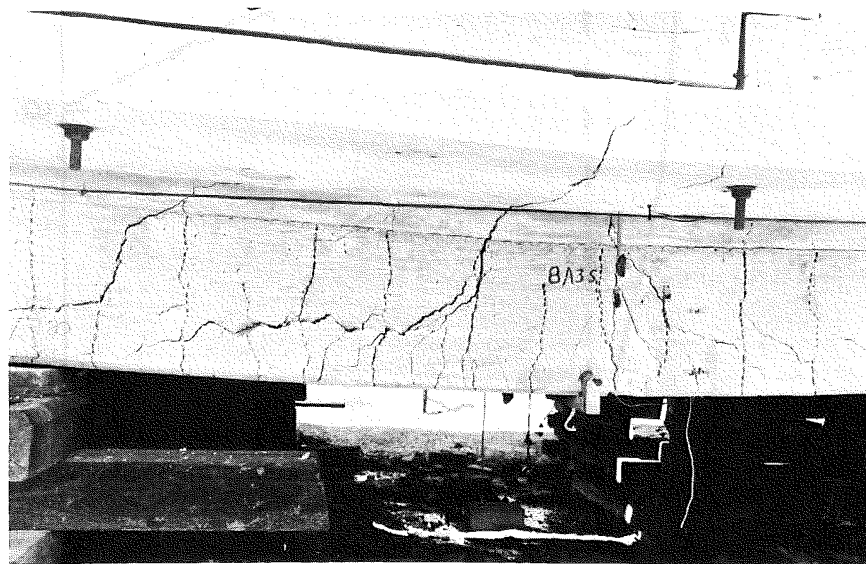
B Photograph of One of the Reinforced Concrete Beams
